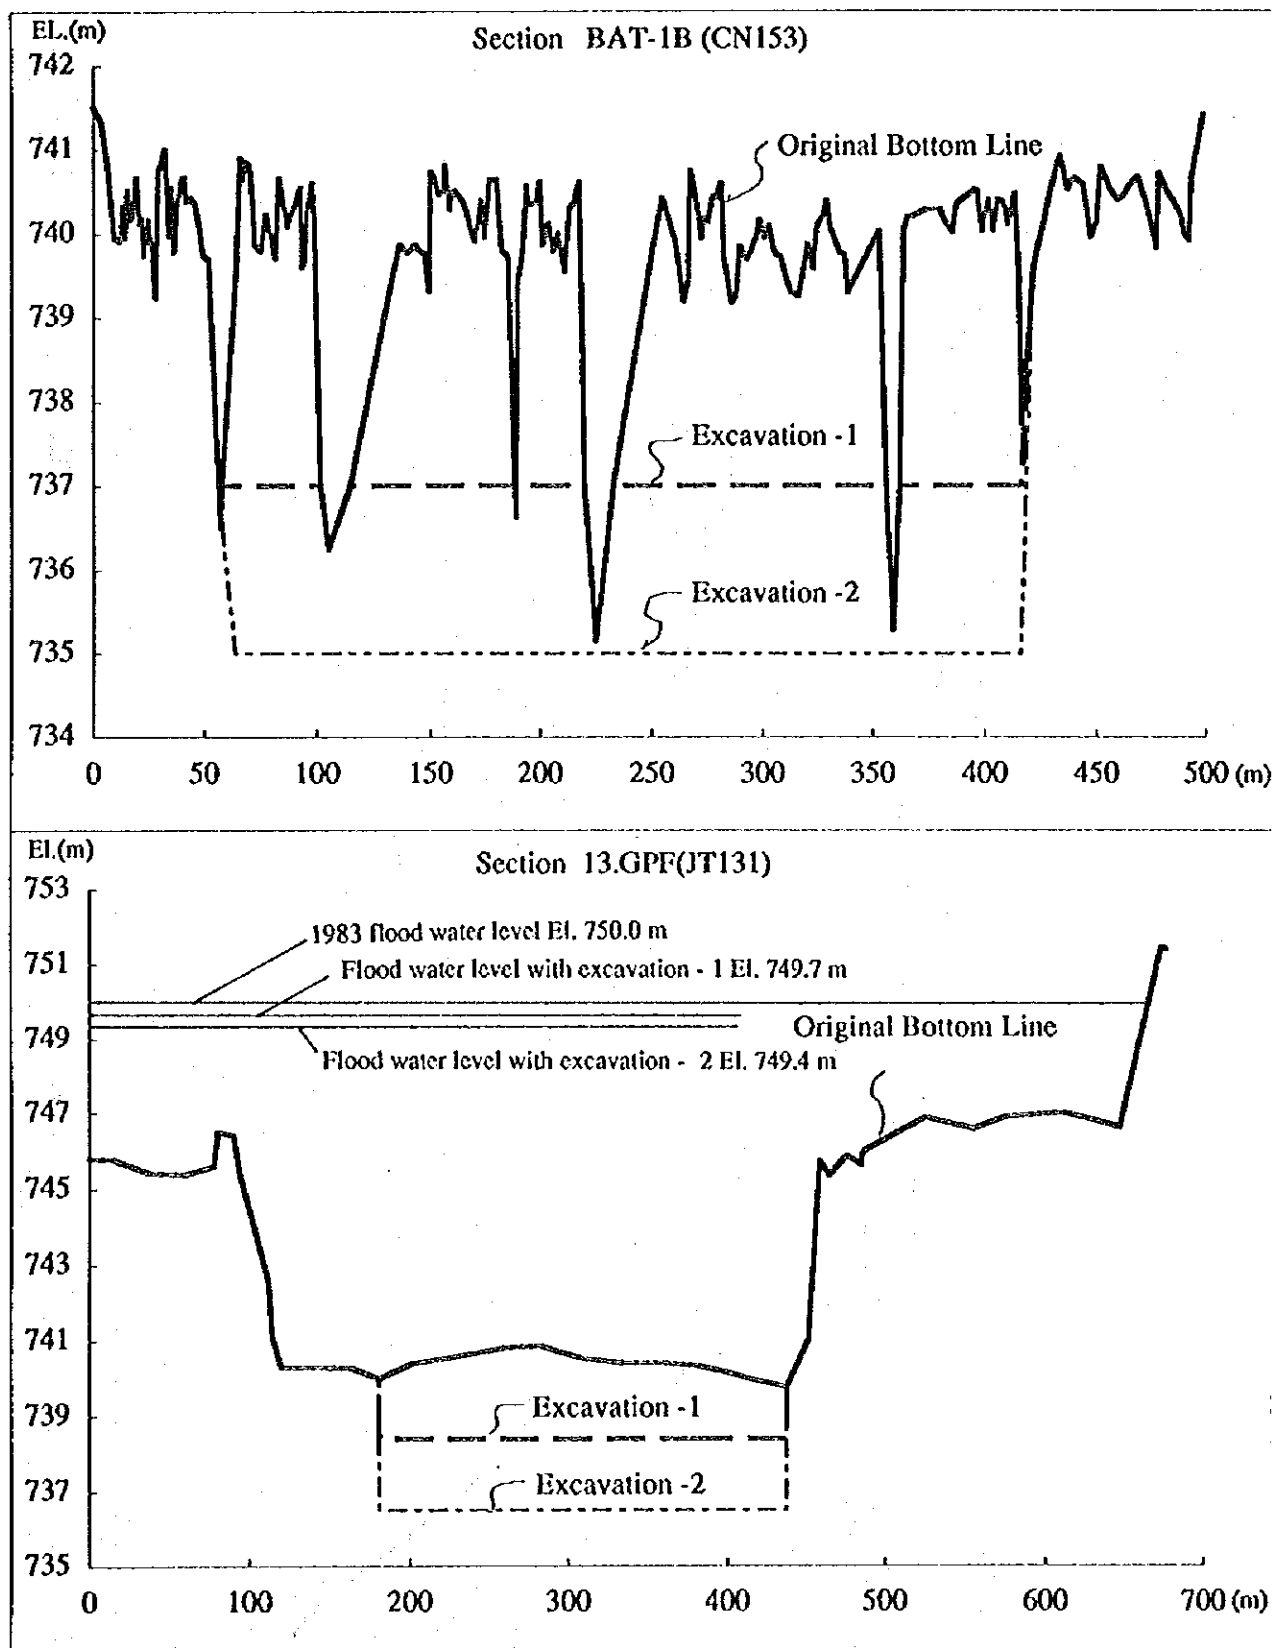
Excavation Lines of Cross Section BAT-1B and 13.GPF
